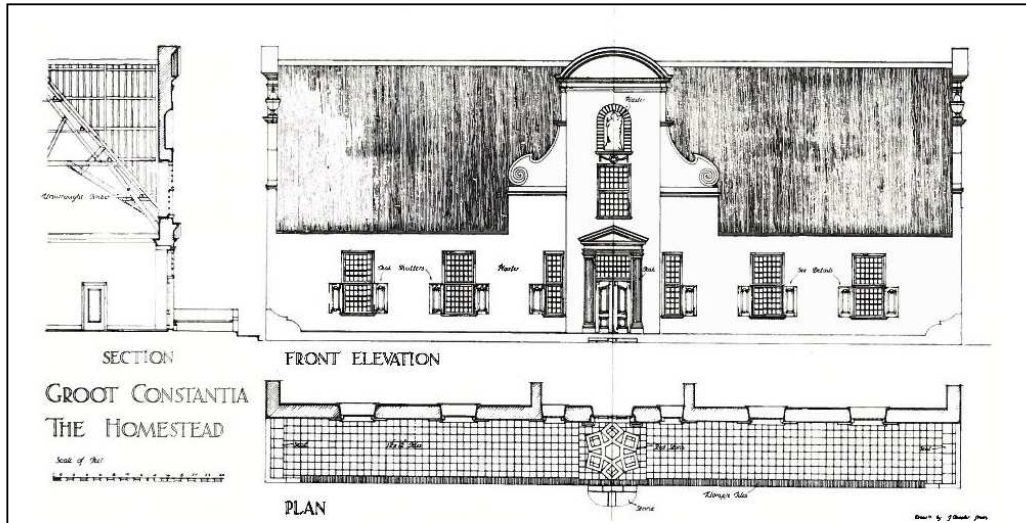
Typical Cape homestead building constructed in earth construction. (Pearse, 1968: 39)
